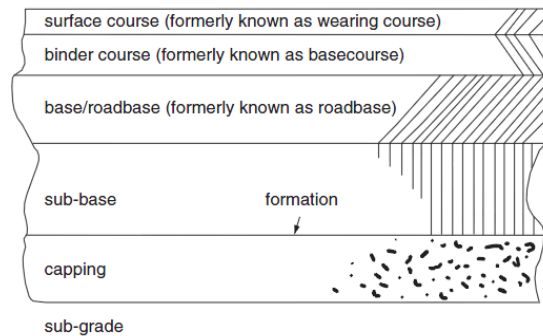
Typical road pavement structure Copson et al ,2004)
